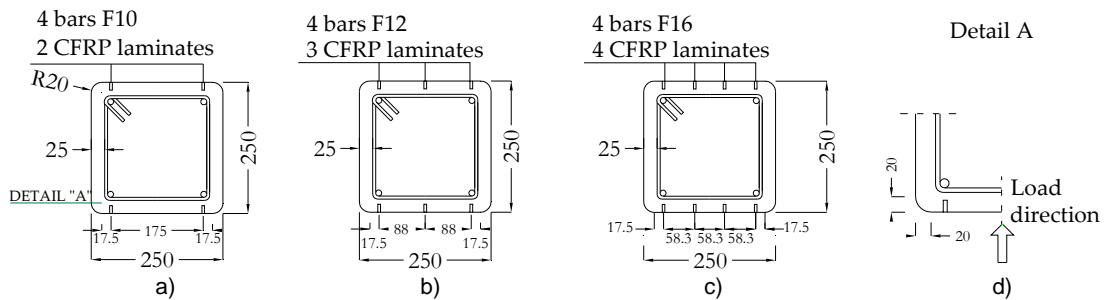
Reinforced sections of the column specimens (dimensions in mm).
